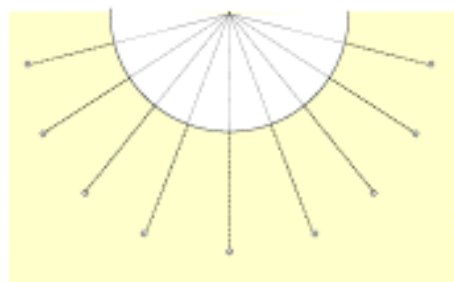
Excavation: water tight geotextile reinforcement + sealing
